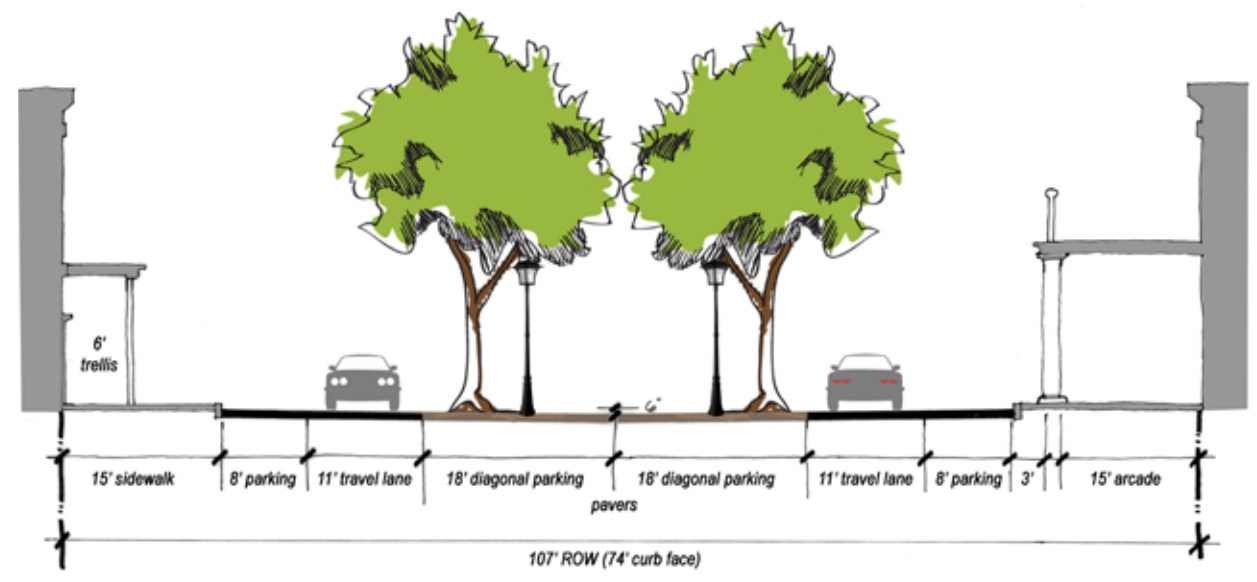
DOWNTOWN PLAN PARKING PLAZA OPTION STREET VIEW
